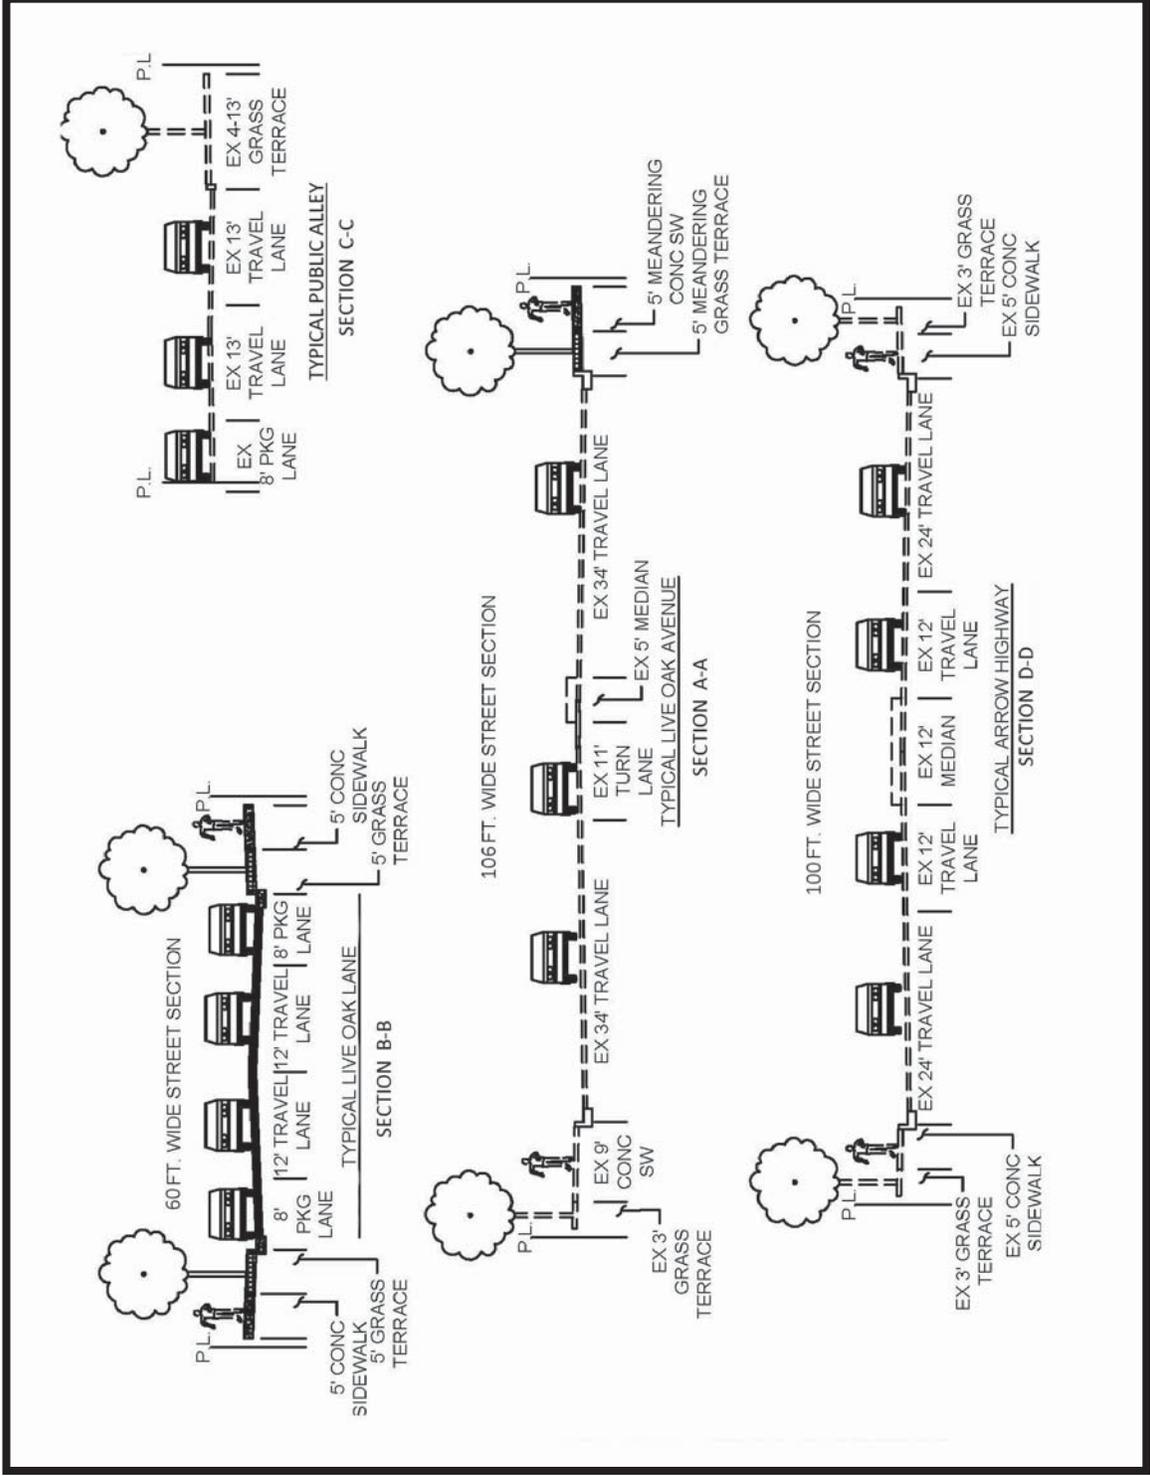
TYPICAL ROW CROSS-SECTION
